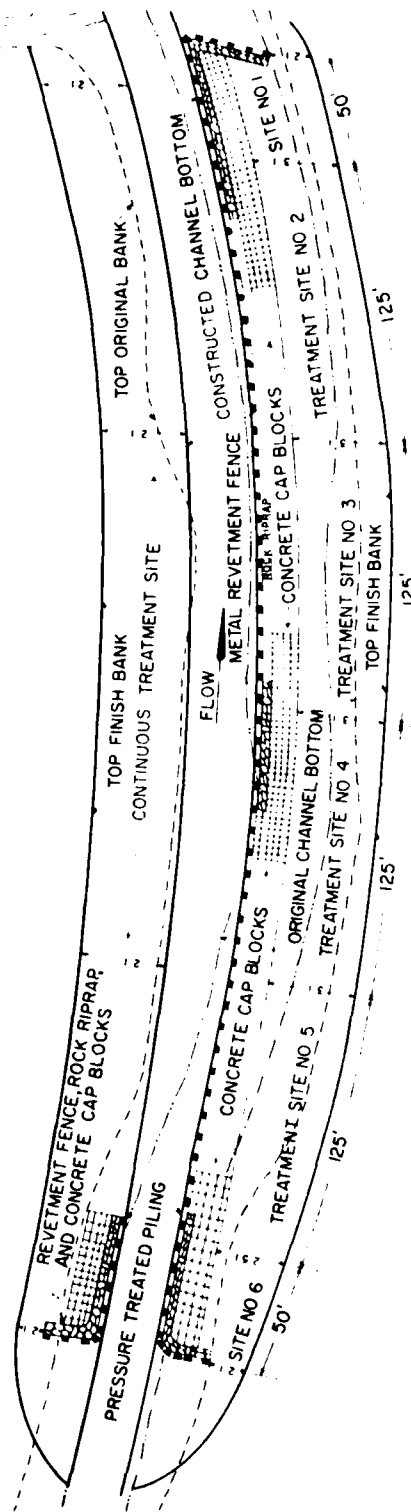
Site Plan of Johnson Creek Study Reach No. 4
